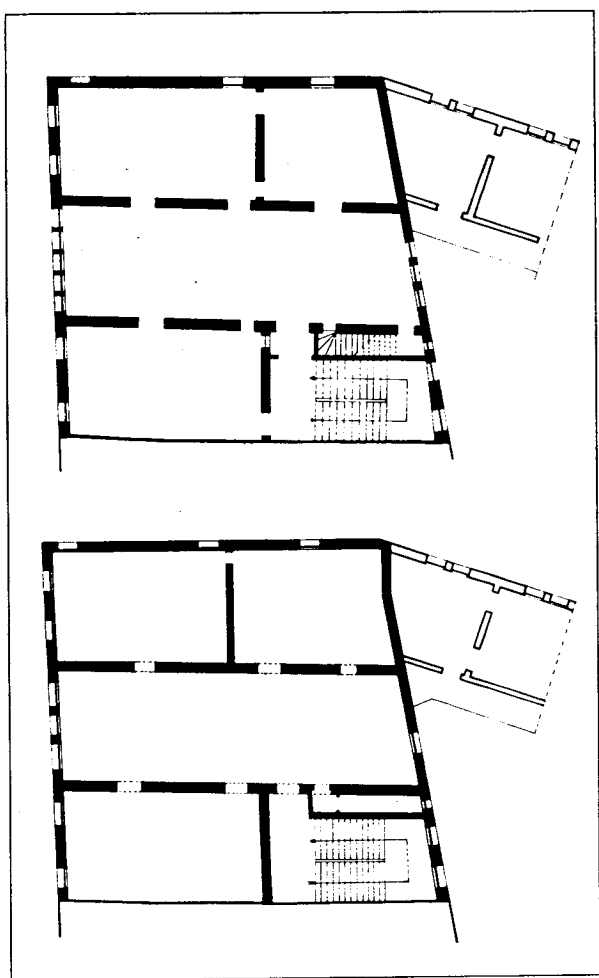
Palazzo Bessarione (Padua, c. 1490): plans of first mezzanine and piano nobile (from Cevese)
